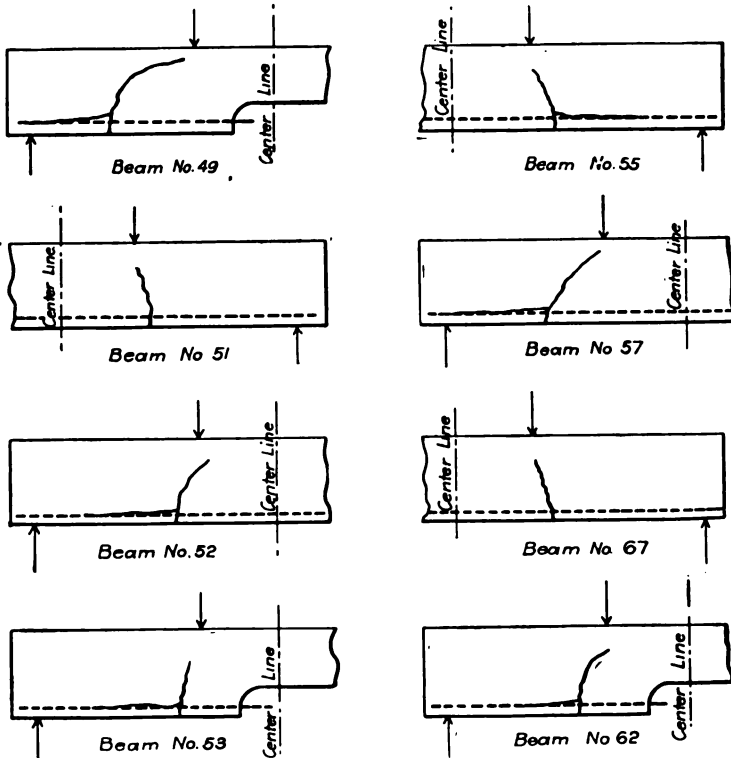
Failures of Beams Reinforced with Tool Steel.
